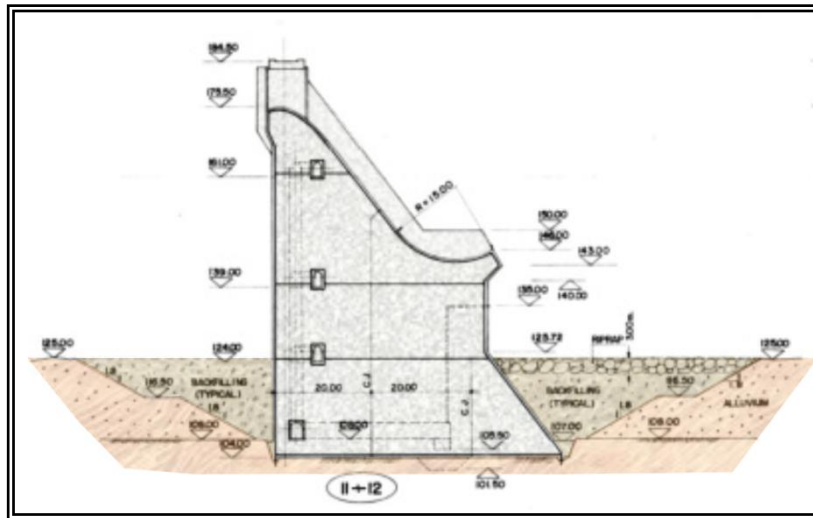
A cross section on Wadi Rabigh dam showing spillway and galleries.
